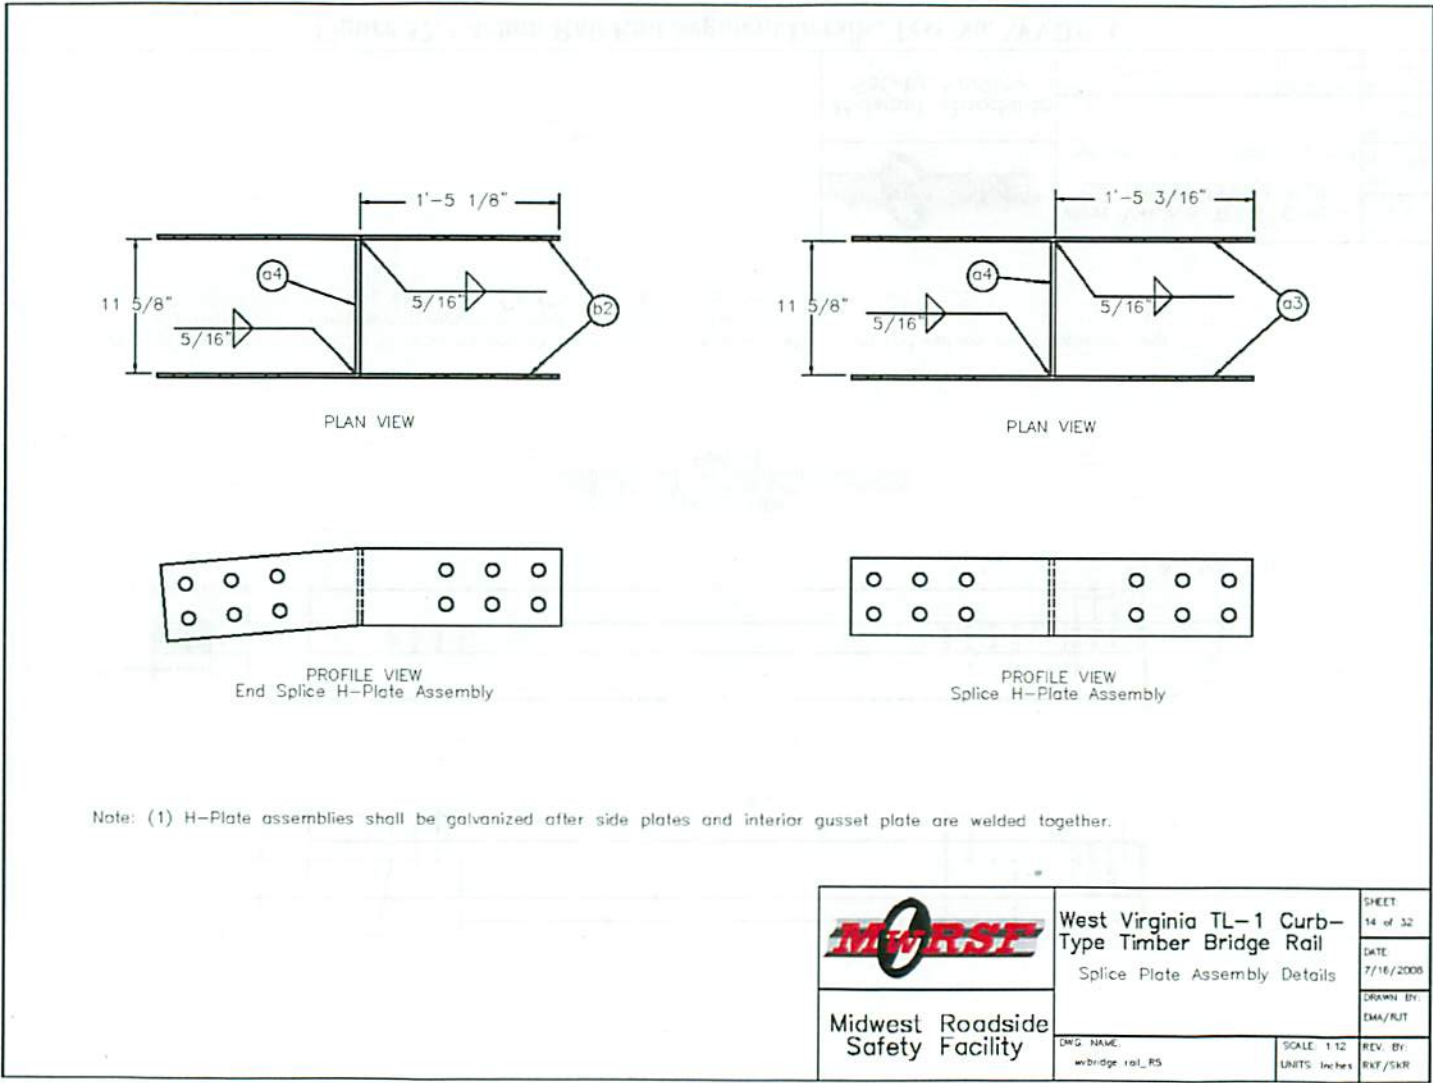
Splice Plate Assembly Details, Test No. WVBR-1
